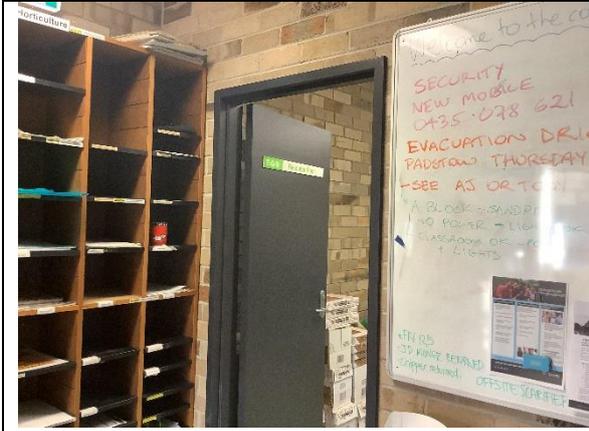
Building E – Throughout – Doors and door frames – Paint - Grey
